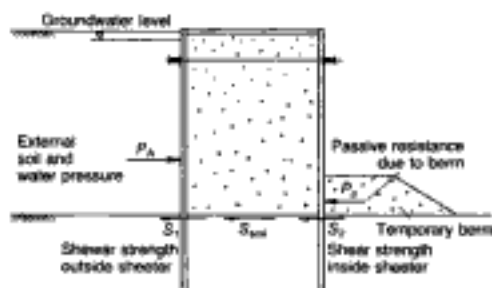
Sliding and resisting forces in double-wall cofferdam, vertical cross-section
